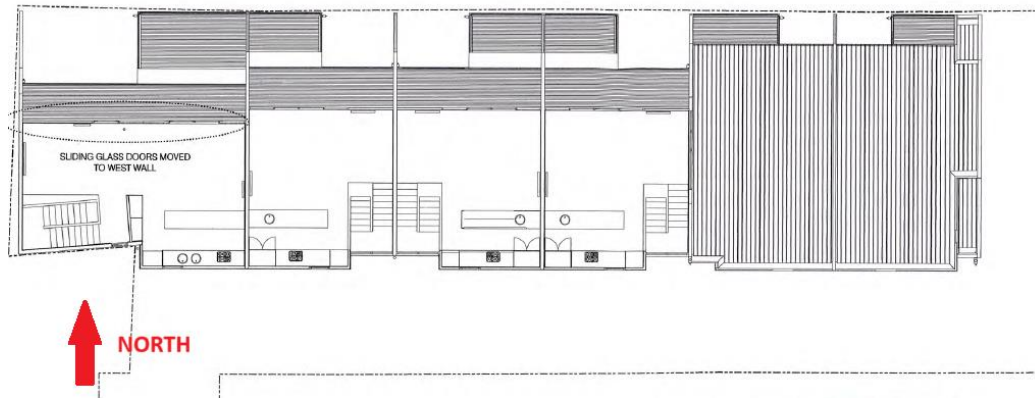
No. 7 Sanders Place endorsed second floor plan (PL01/0765)
